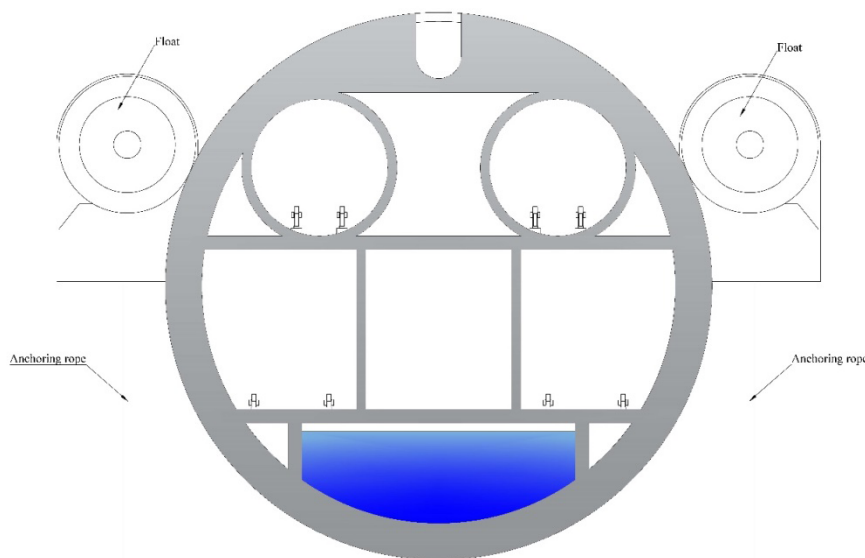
Option of the layout solution for the oceanic section of the floating overpass, section at the point of anchoring systems fastening
